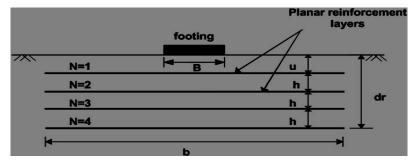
Layout and Configuration of Geogrid-Reinforcement in Sand, Under Shallow Strip
